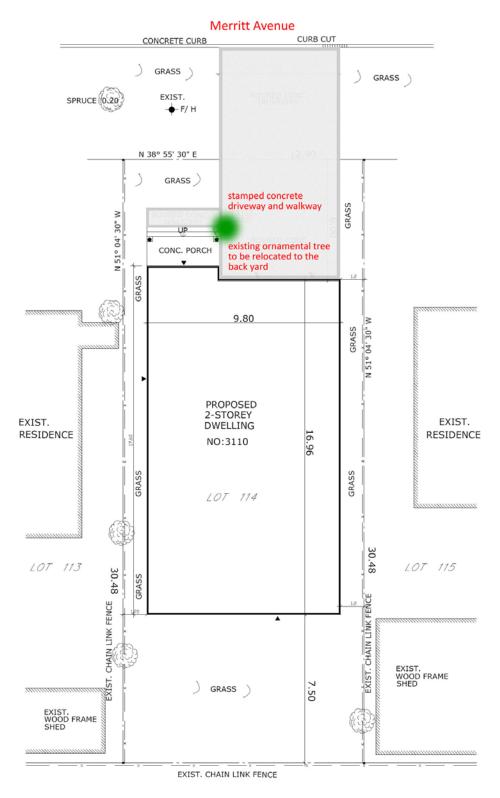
Site plan showing the footprint of the proposed new dwelling, the concrete driveway and walkway, and the existing ornamental tree to be relocated to the back yard.
